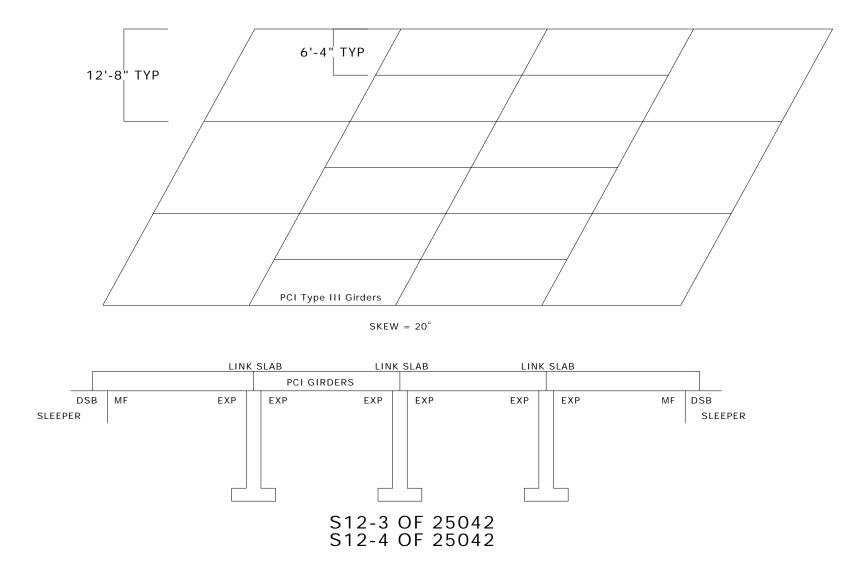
Plan and elevation of S12-3 and 4 of 25042
